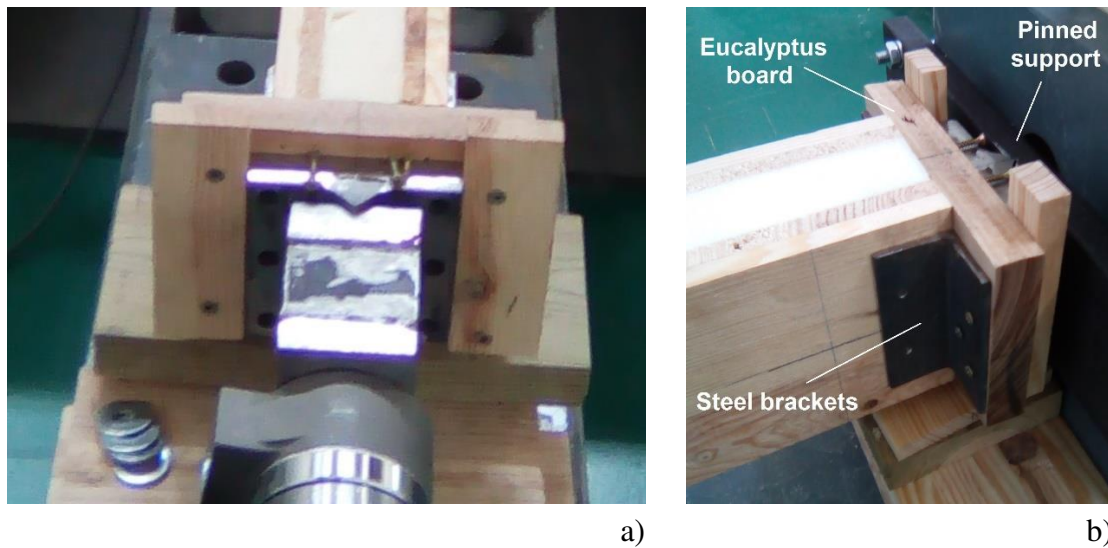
Details of the supports: a) pinned support at the steel plates; b) connection between the test specimen and the steel support.
